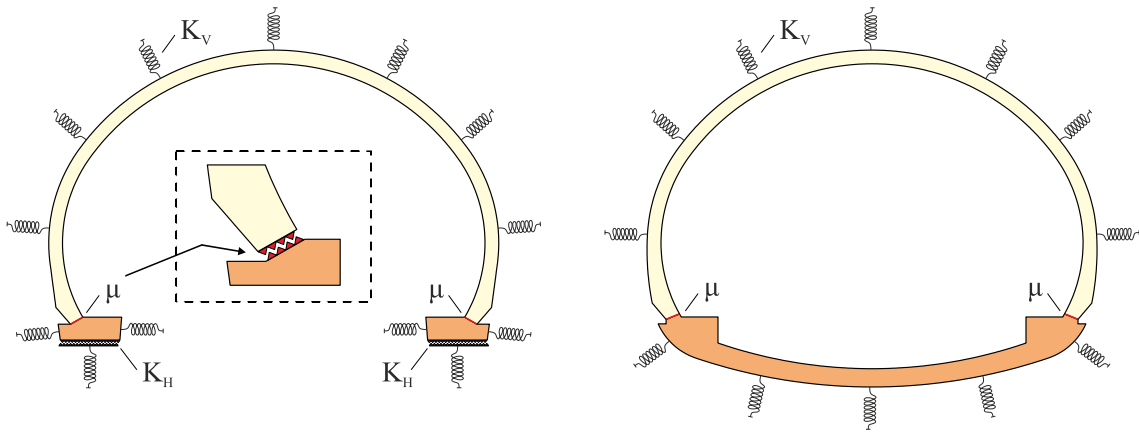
Boundary conditions between tunnel lining and surrounding rock mass.
